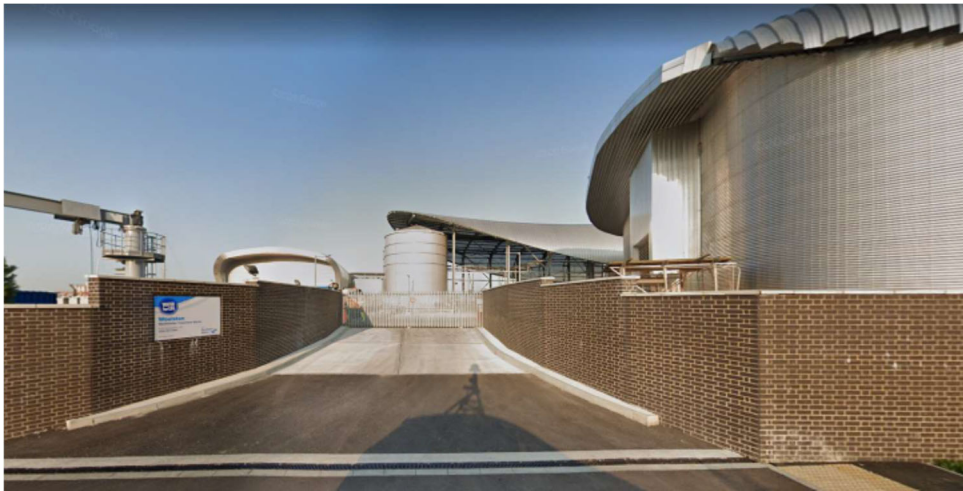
Newly constructed Woolston Wastewater Treatment Works
